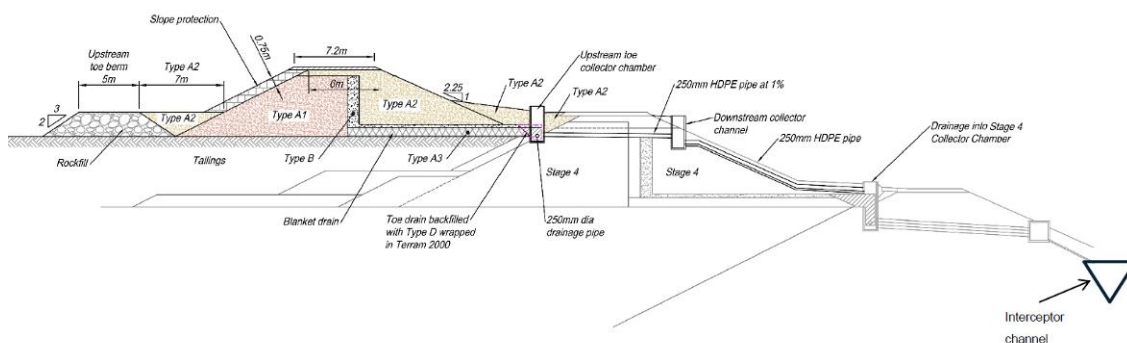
C. S. Embankment wall. Internal drainage system and PIC
